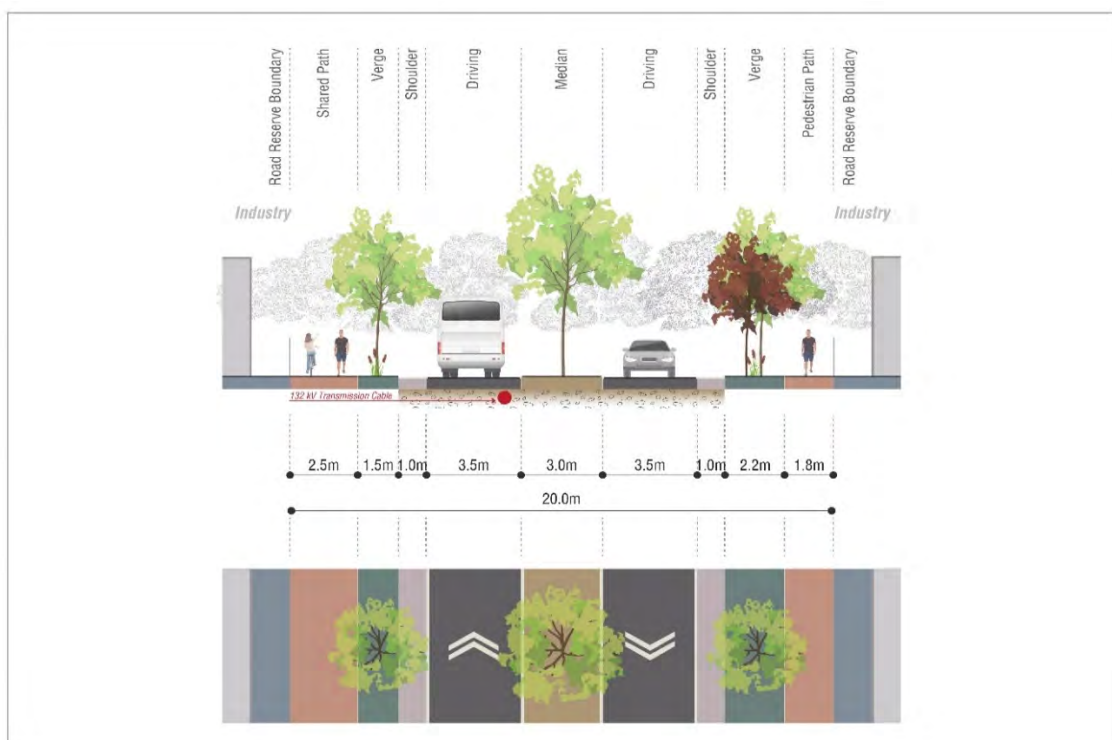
RD11 Ibis Place / Enterprise Boulevard Cross Section
